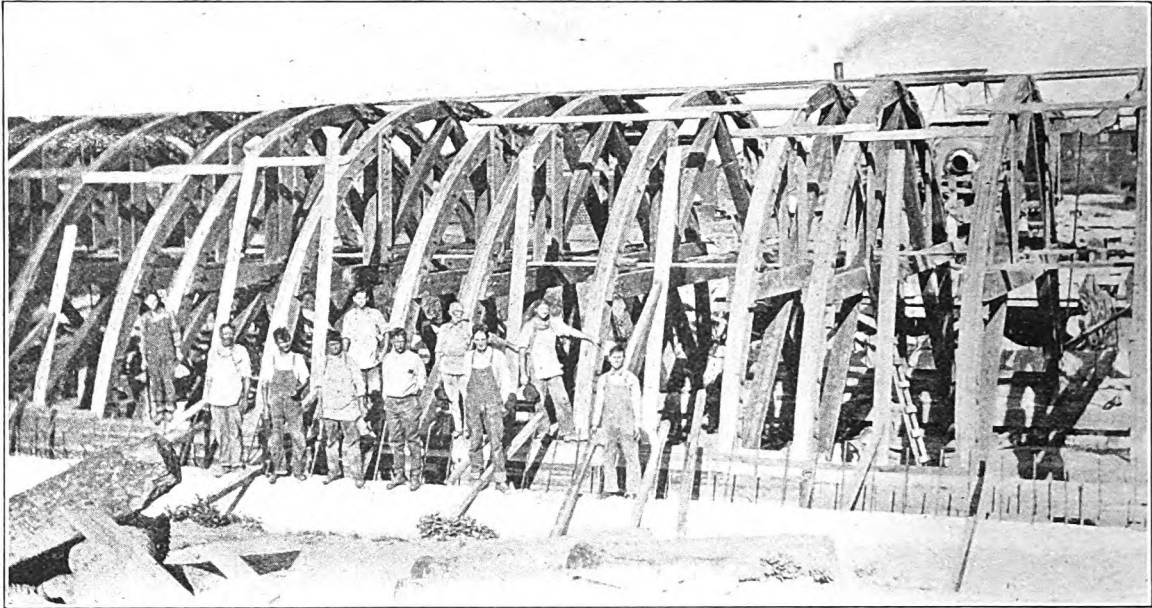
Forms for 36-ft. Concrete Arch at Aspinwall.
